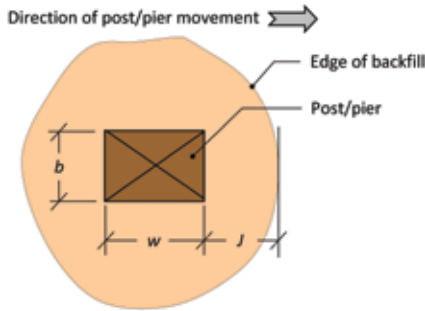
Top view of foundation showing distance *J* between the post/pier/footing/collar and the edge of the backfill
